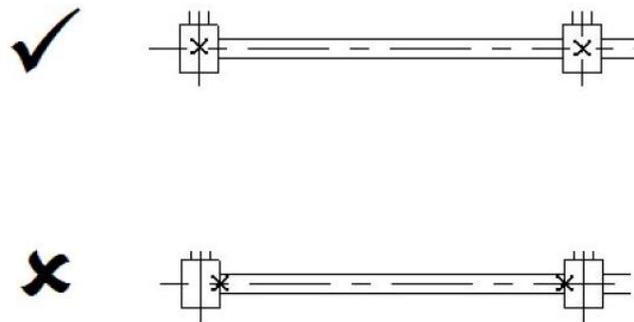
Framing Elements span to span (Image courtesy of CSC)
